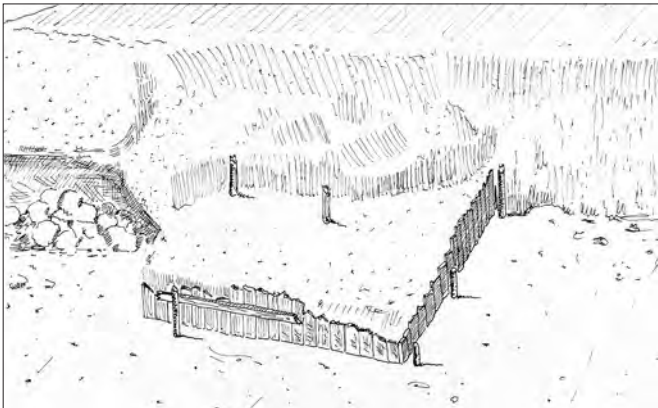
Sketch of concrete formwork on the Molo Sinistro of the Claudian harbour of Portus (O. Testaguzza, used with permission).
